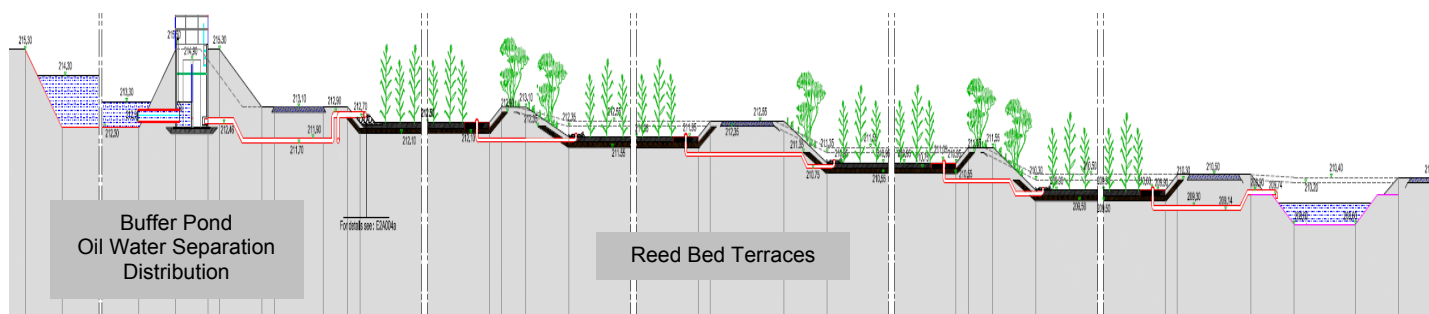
Nimr Water Treatment Plant – Reed Bed Cross Section
